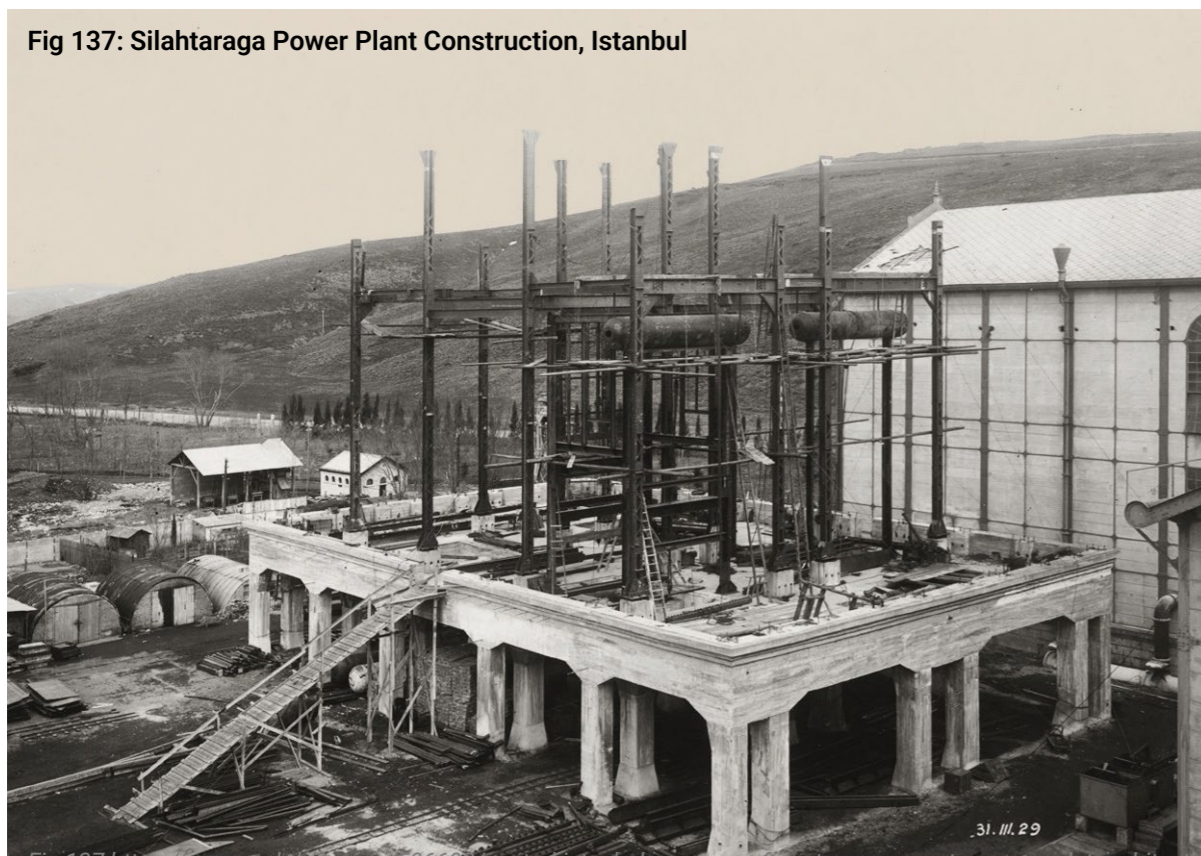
Silahtaraga Power Plant Construction, Istanbul
